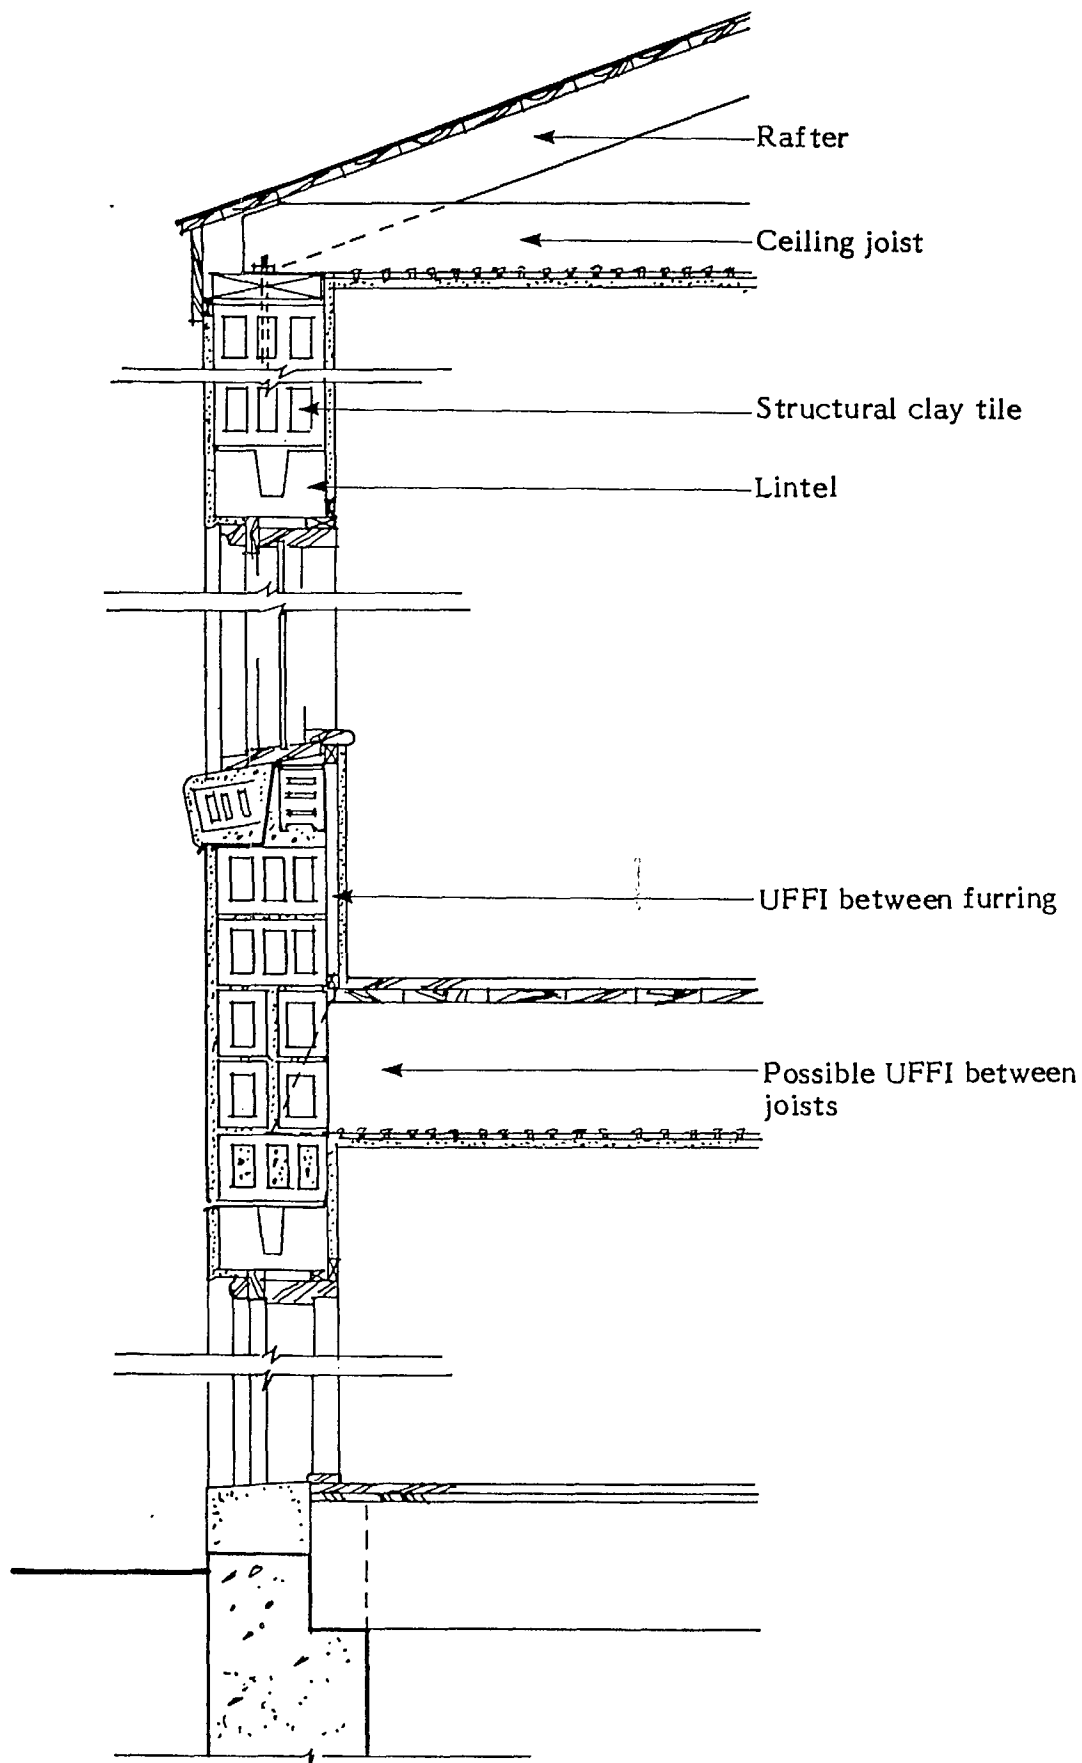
STRUCTURAL CLAY TILE WALL
